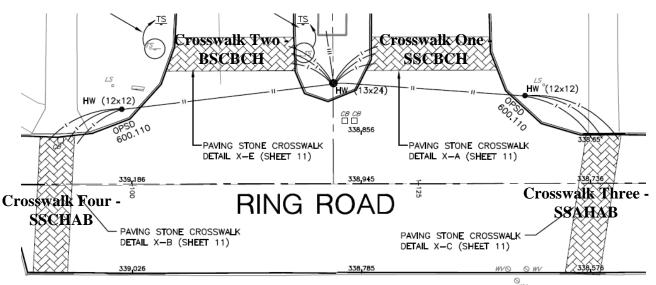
Layout of Crosswalk Test Sections at UW Ring Road
